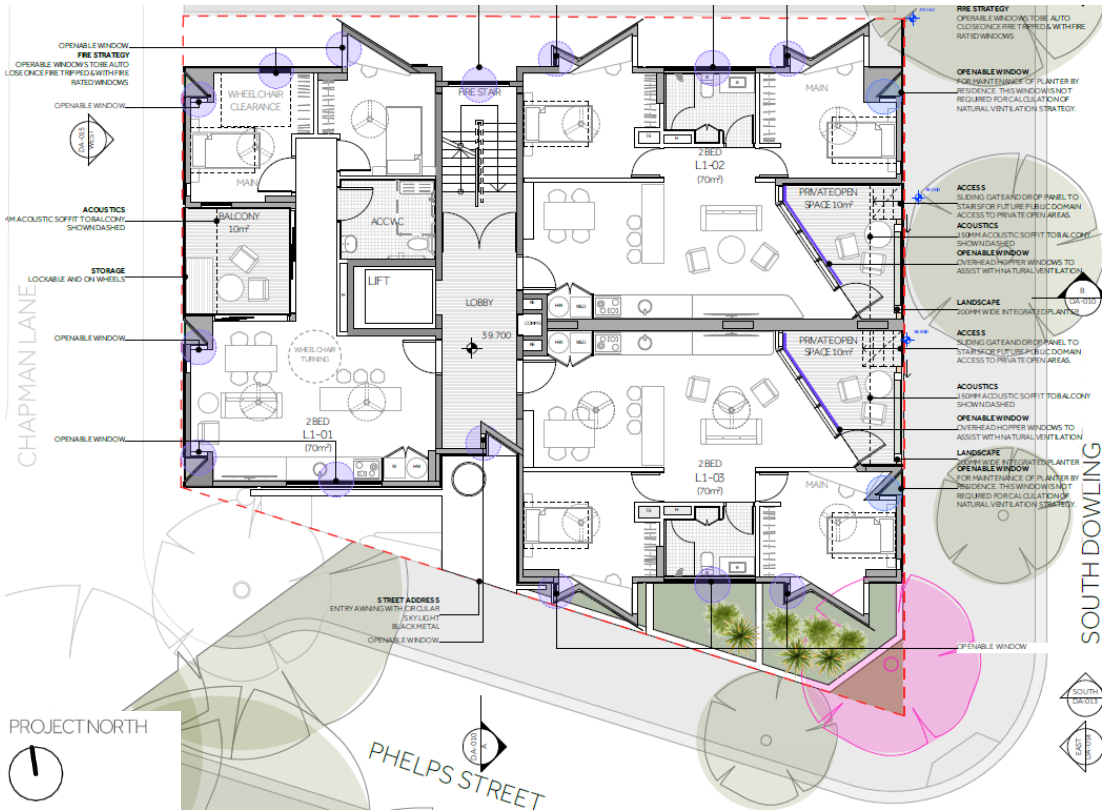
Proposed Level One (South Dowling Street) Floor Plan
